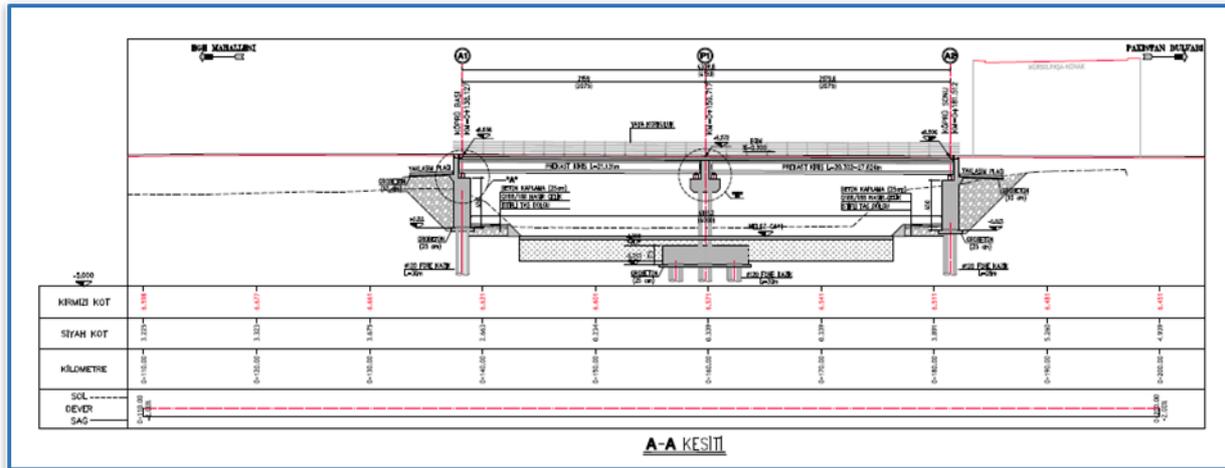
Layout Plan of the Meles Stream K 20 Bridge in Yeni Ege Neighbourhood
